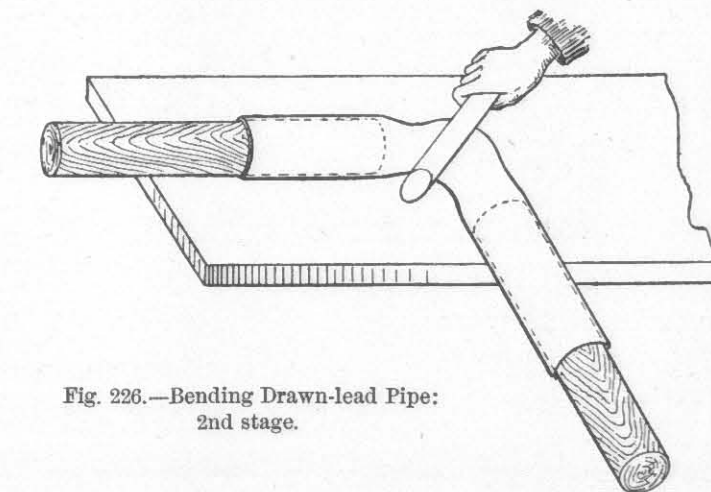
Bending Drawn-lead Pipe: 2nd stage.
